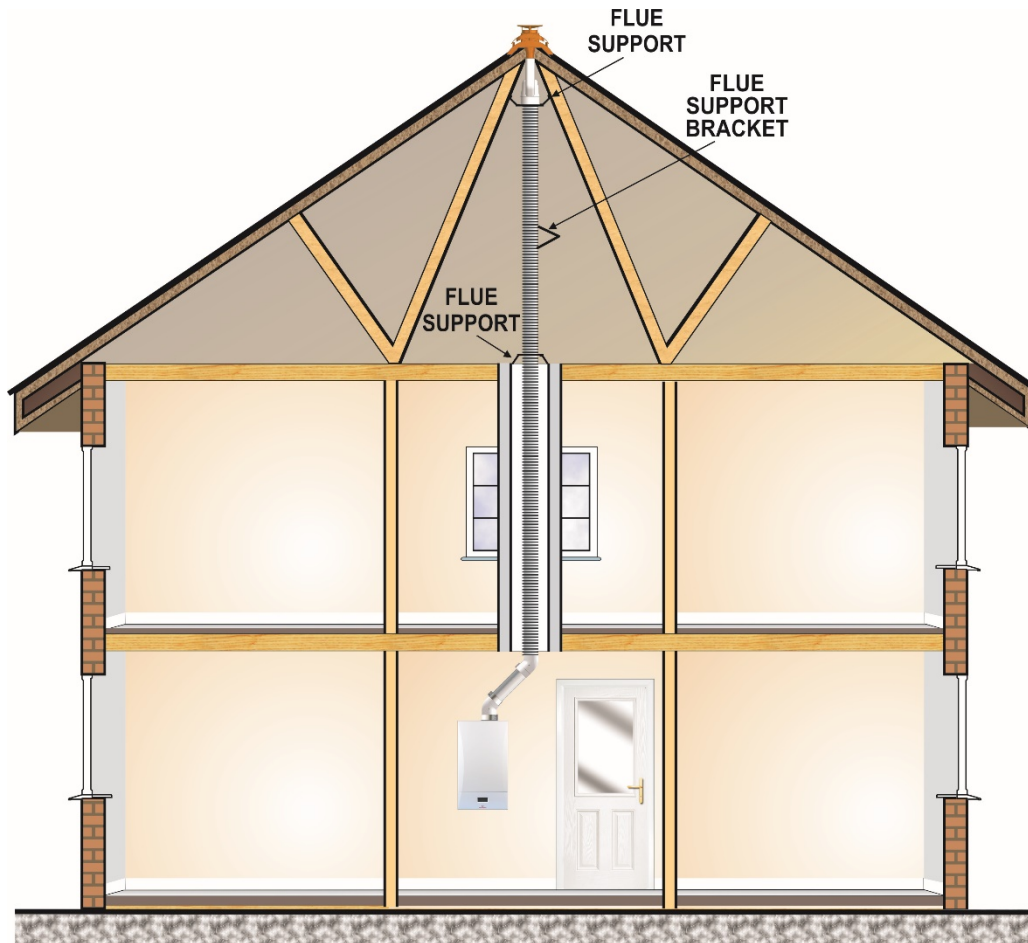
Traditional chimney system from boiler to flexible chimney system in a void and roof space. Check manufacturer's literature to see if this installation arrangement is approved.
